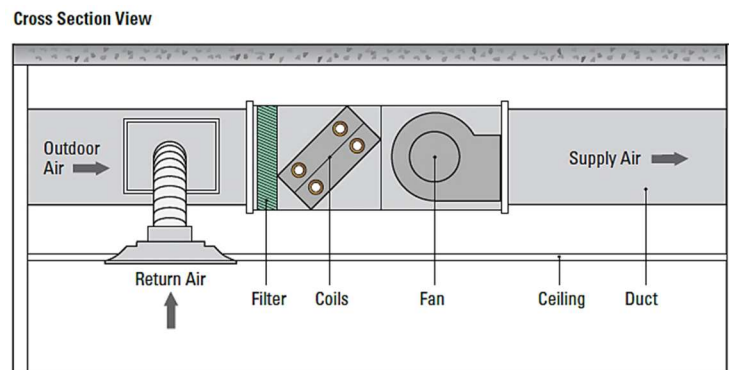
Blower Coil Unit (Source: Engineering Guide Fan & Blower Coils)
